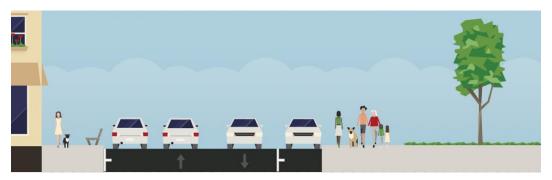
Existing Morton Avenue cross section (made with Streetmix)
